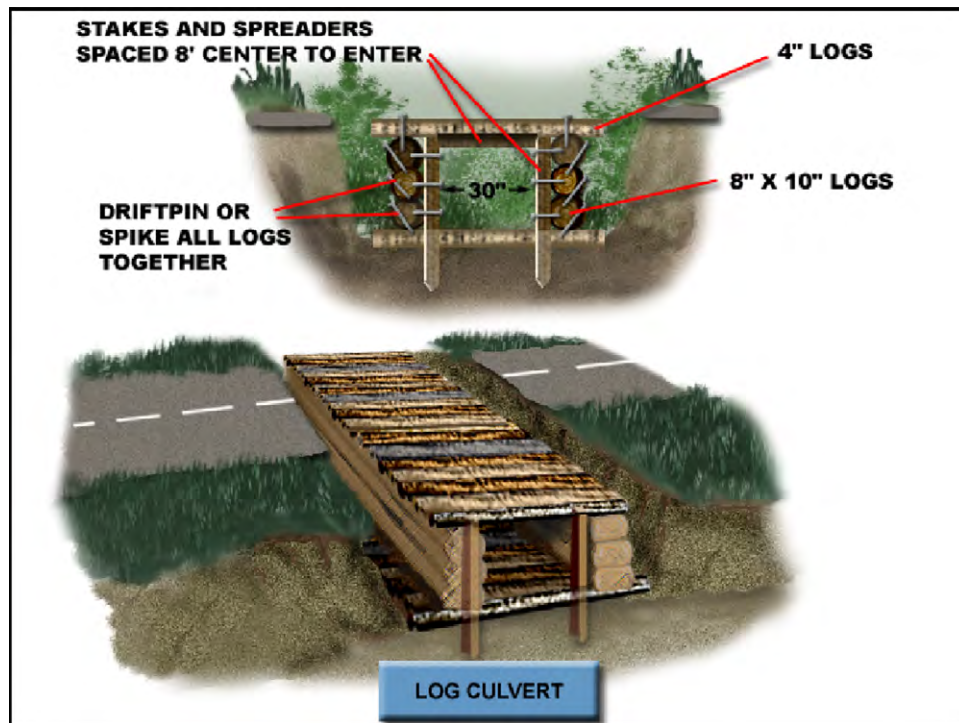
Spiking and Fastening a Log Box Culvert.
